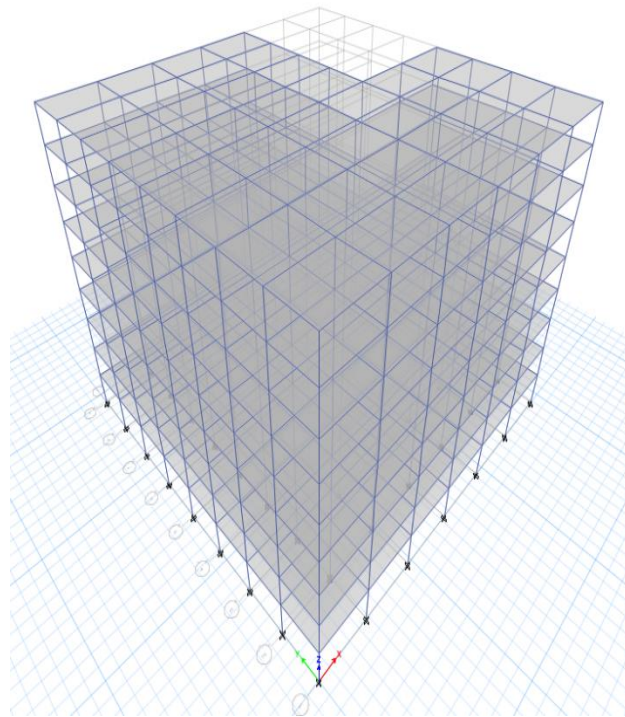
Three Dimensional view of G+8 Fixed base RCC Frame Building
